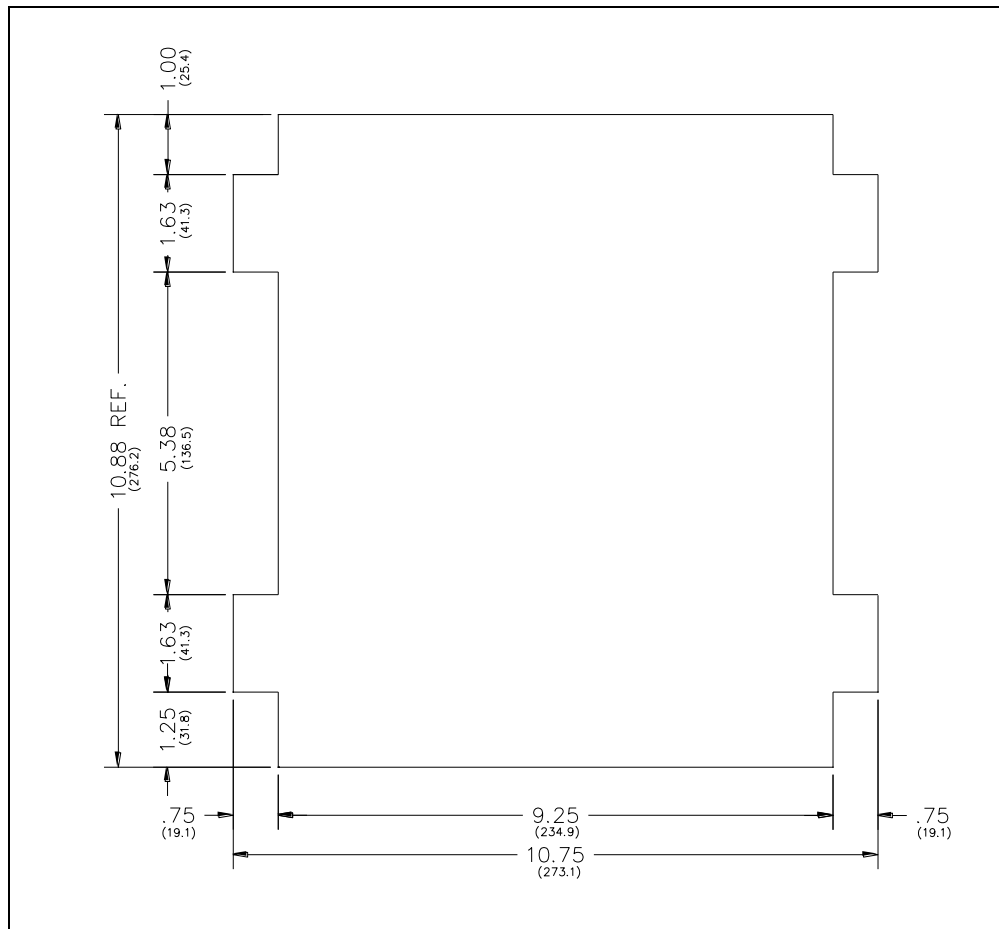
Wall Cut-out Dimensions for Model 295-712F
